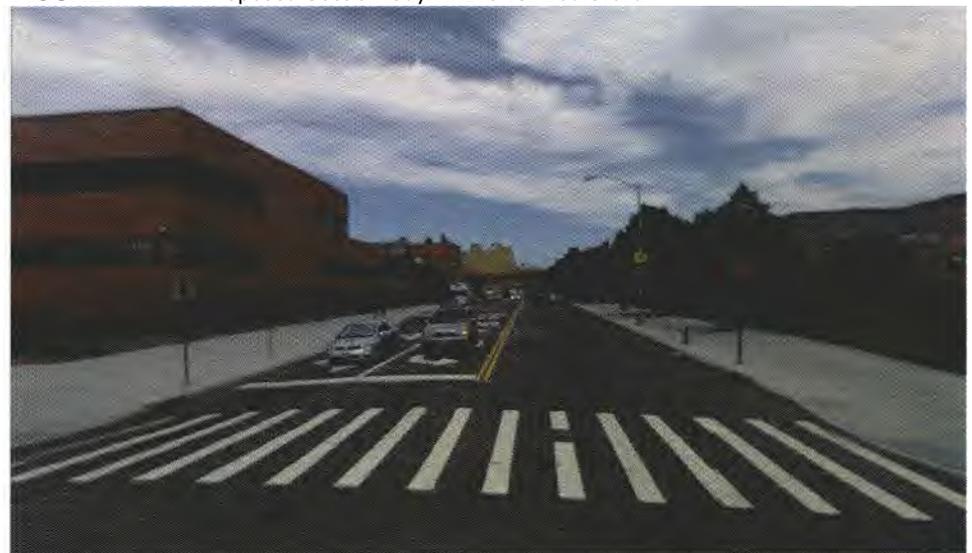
Existing View Guy R. Brewer Boulevard
